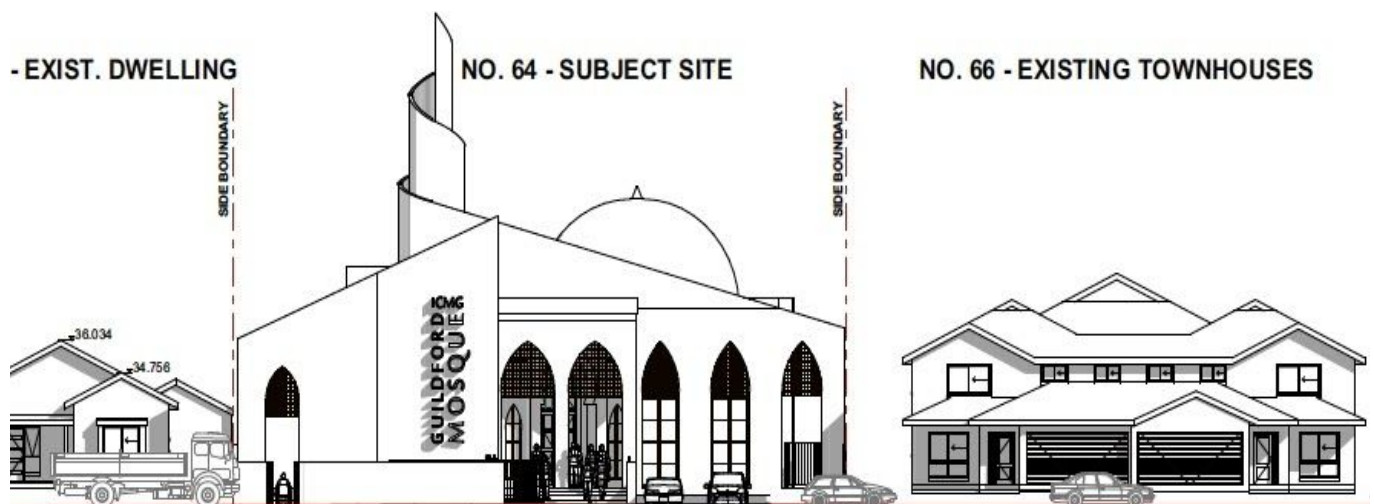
streetscape elevation showing the proposed building and adjacent built form.⁵
